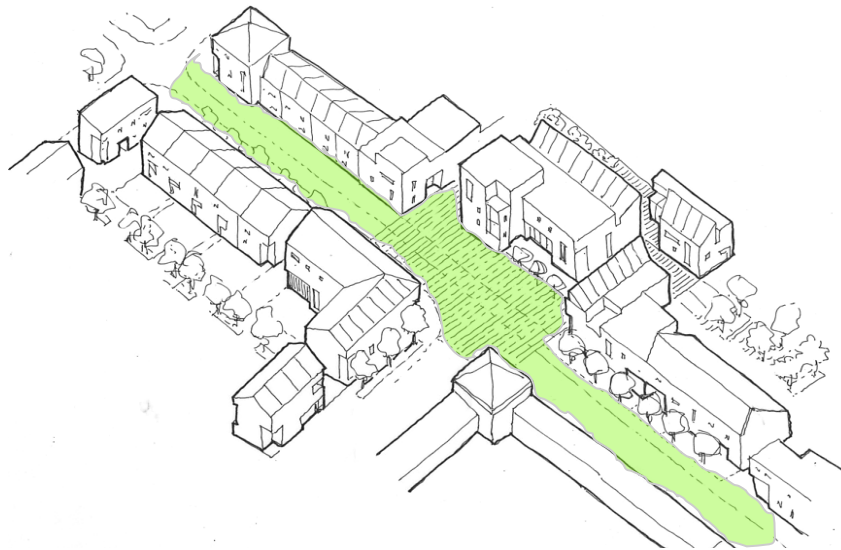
C | Indicative Aerial View of New Village Street
